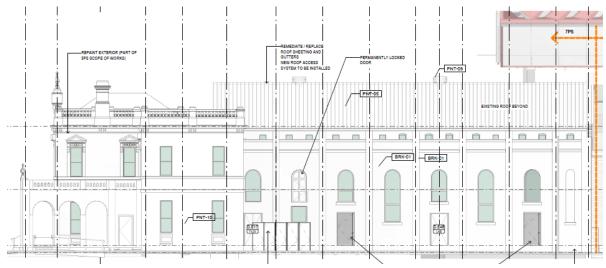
Southern elevation proposed (Source: Architectural Drawing No. AR-DA1-2001, Rev C)
